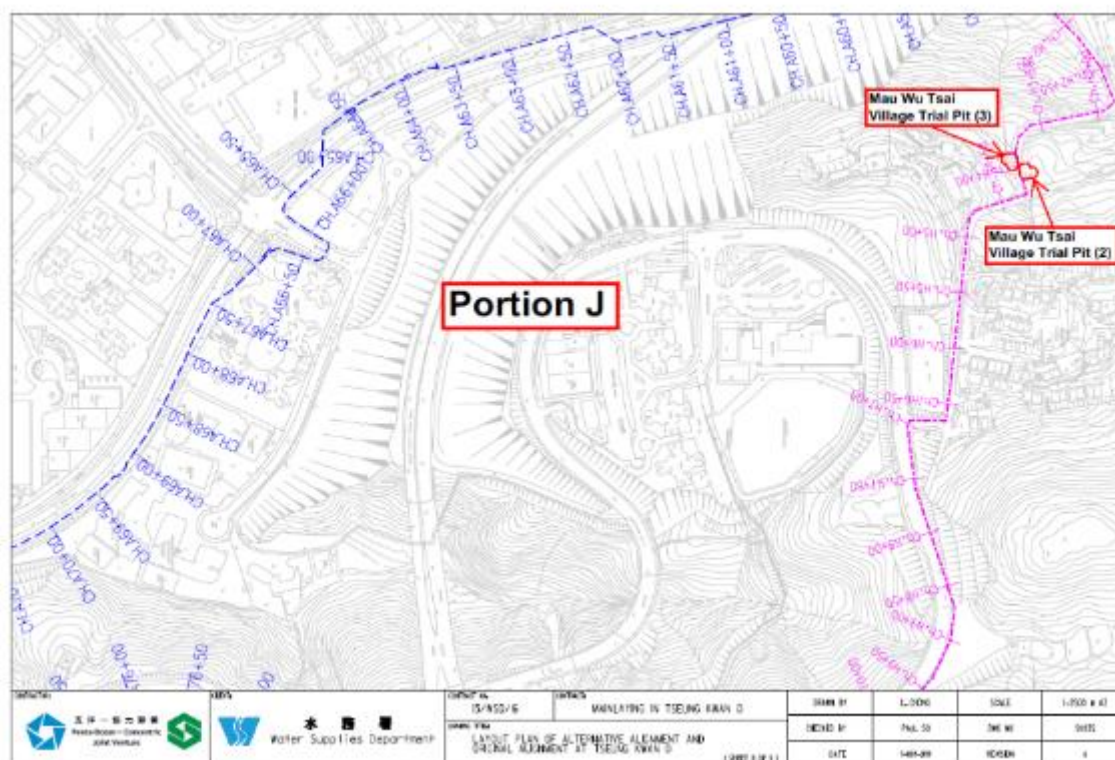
Location Plan for Mau Wu Tsai 2 & 3
